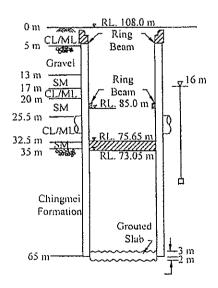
Grout plug at Ventilation Shaft in Contract CH221
